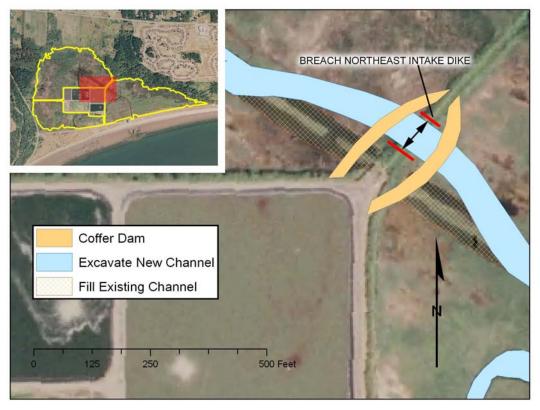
A coffer dam will be constructed to exclude water while the northeast sewer intake dike is breached. A new channel will be excavated to pass through this breach, and the existing channel will be filled. The sewer intake line buried within the dike will be replaced with a UV-and exposure-resistant pipe, and will be supported and protected from damage via an aluminum cage.
